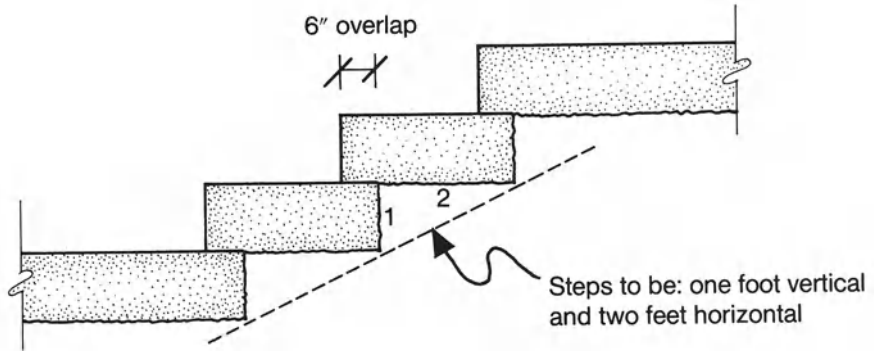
Recommended detail where wall footings must be stepped.
